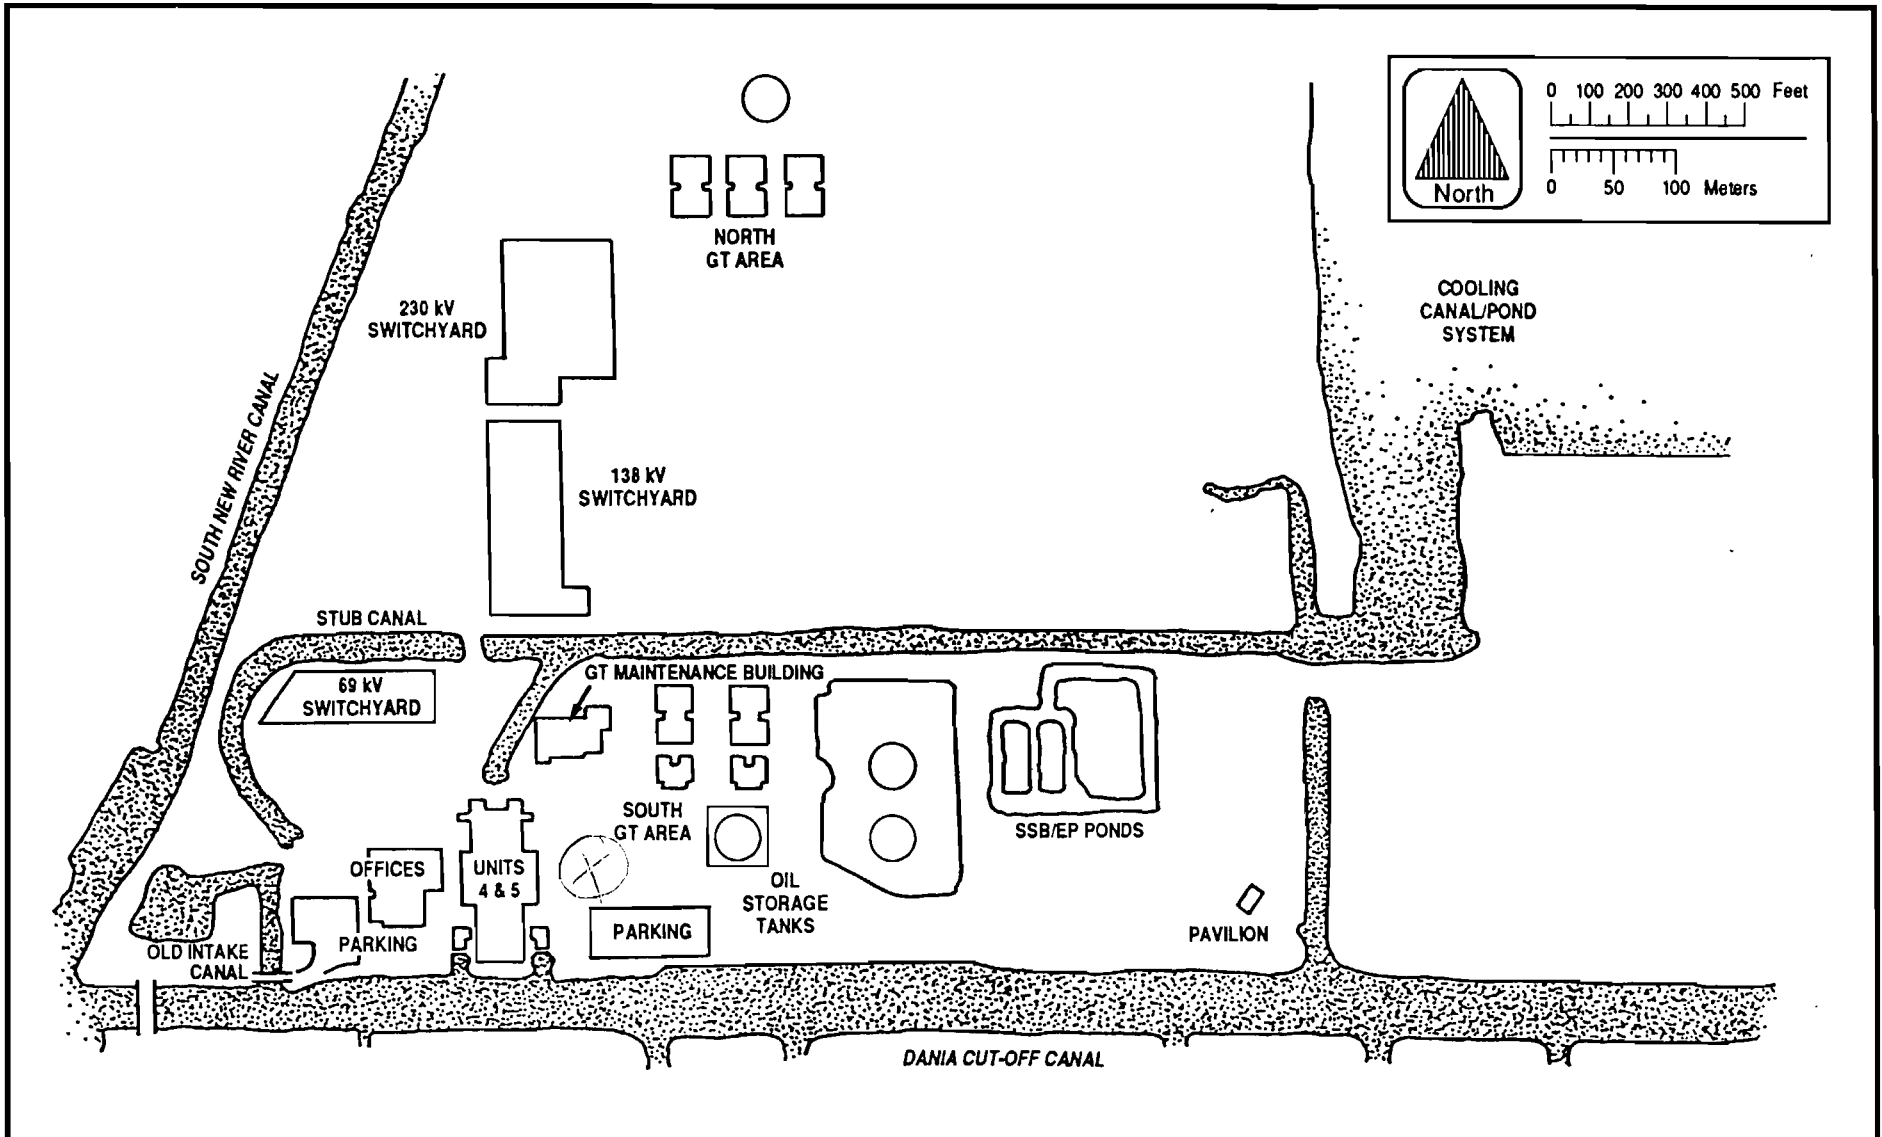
EXISTING LAUDERDALE SITE PLAN
